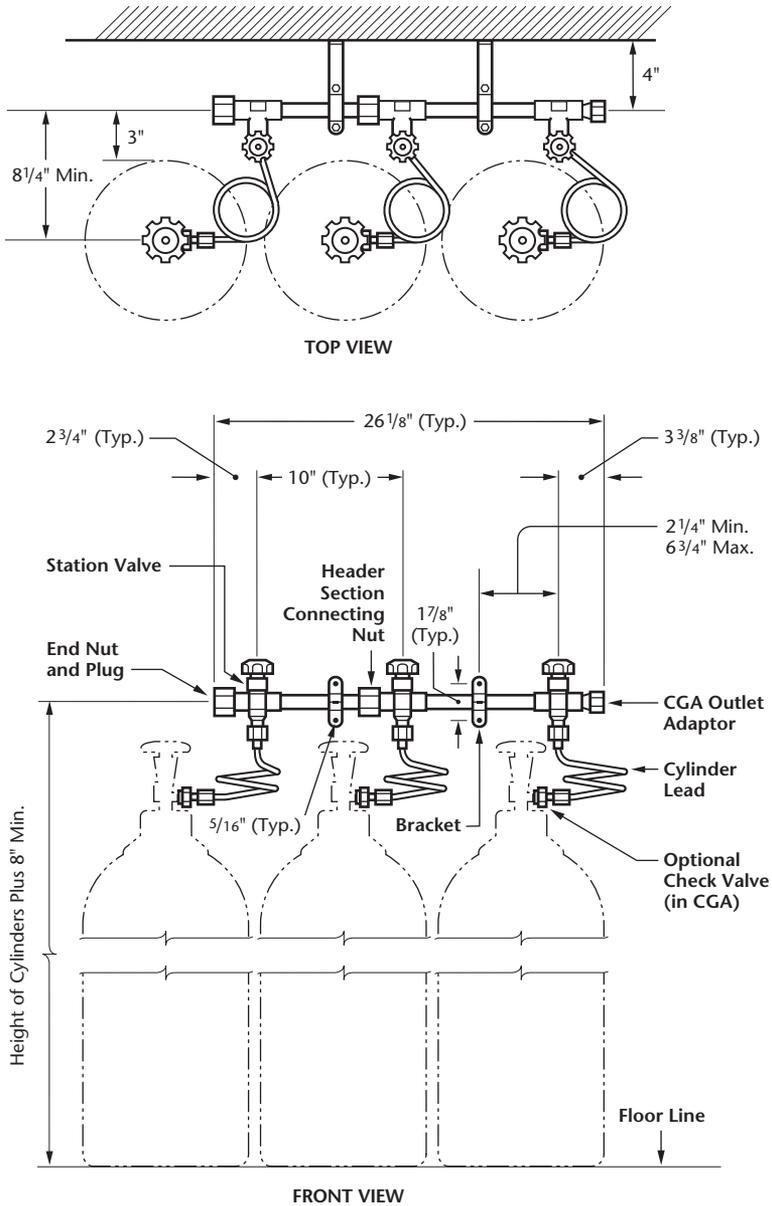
Mounting Dimensions for a Single Row Manifold used on the Left Side of a Back-up Regulator System
